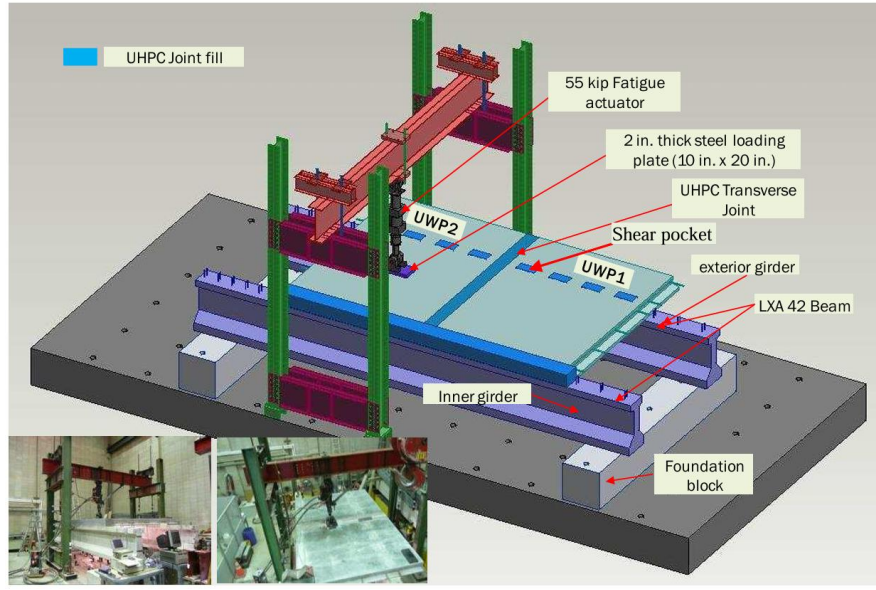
Schematic of the setup used for testing of the UHPC Waffle deck panel system
